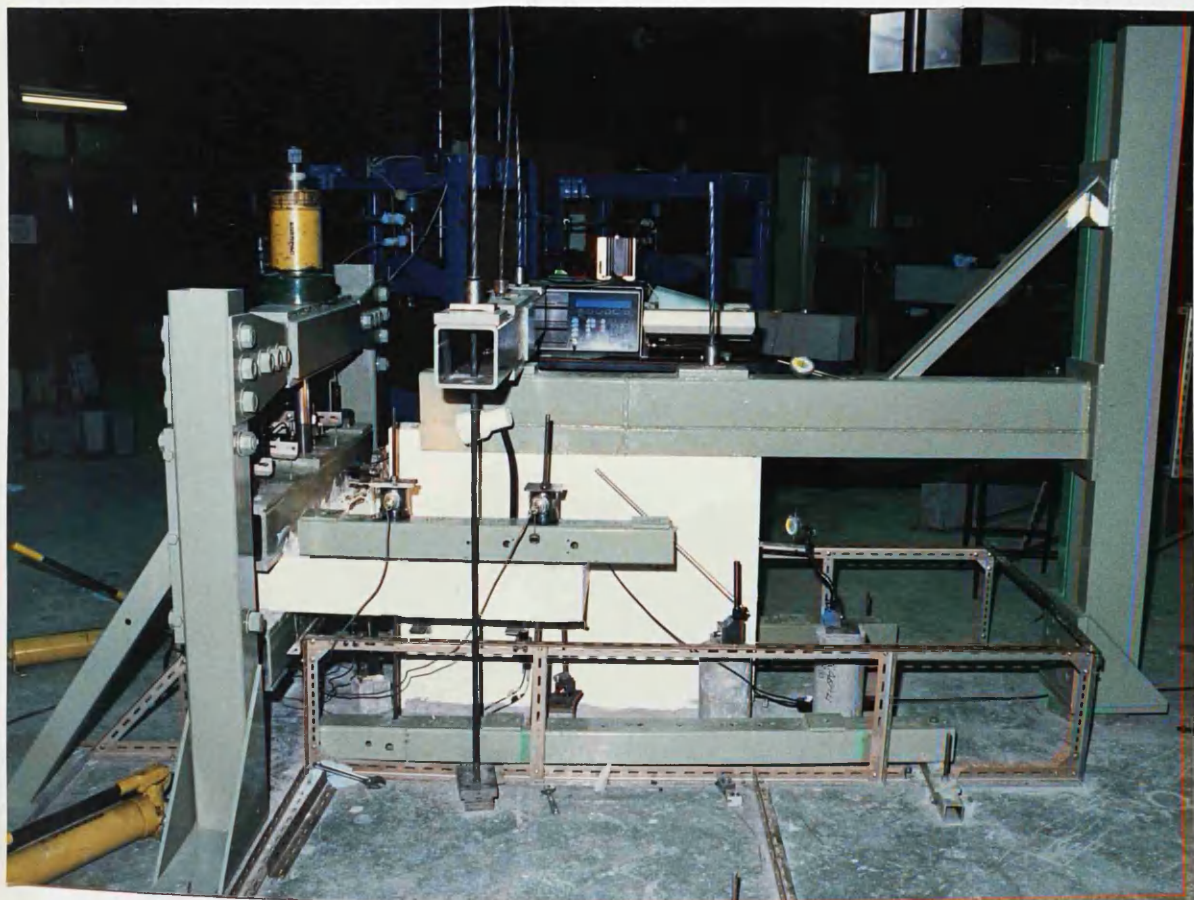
Photograph showing supporting arrangement for reverse cycling models.
